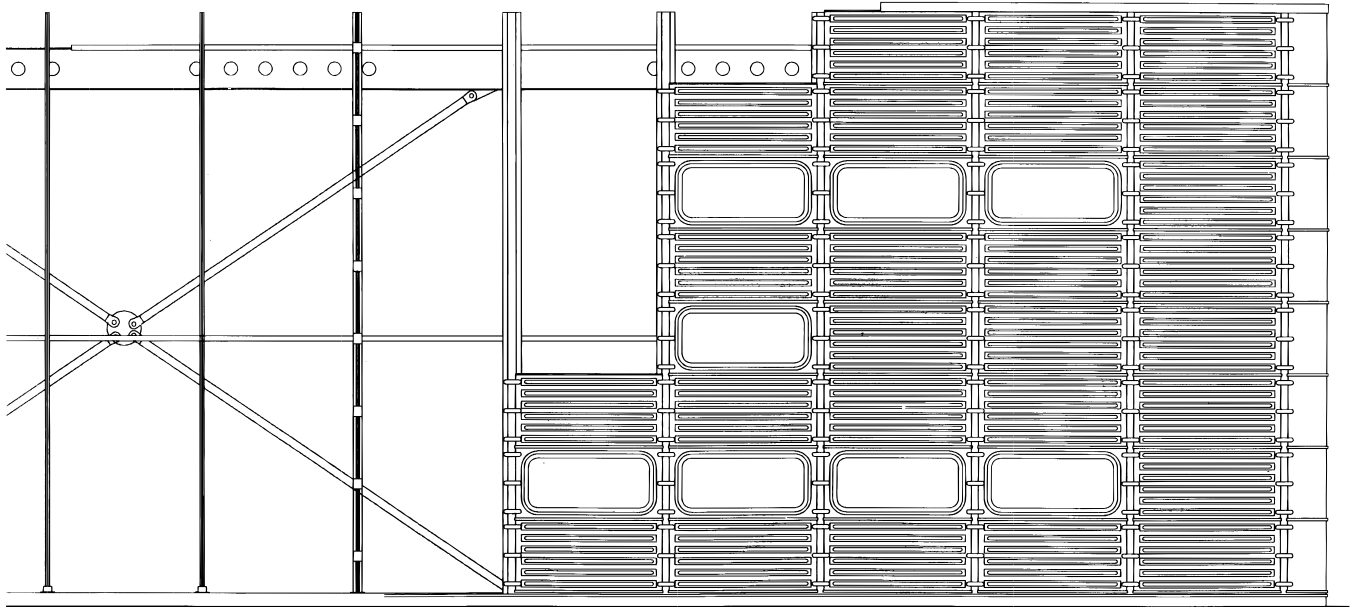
Detailed elevation with cladding partially omitted to show structure.
